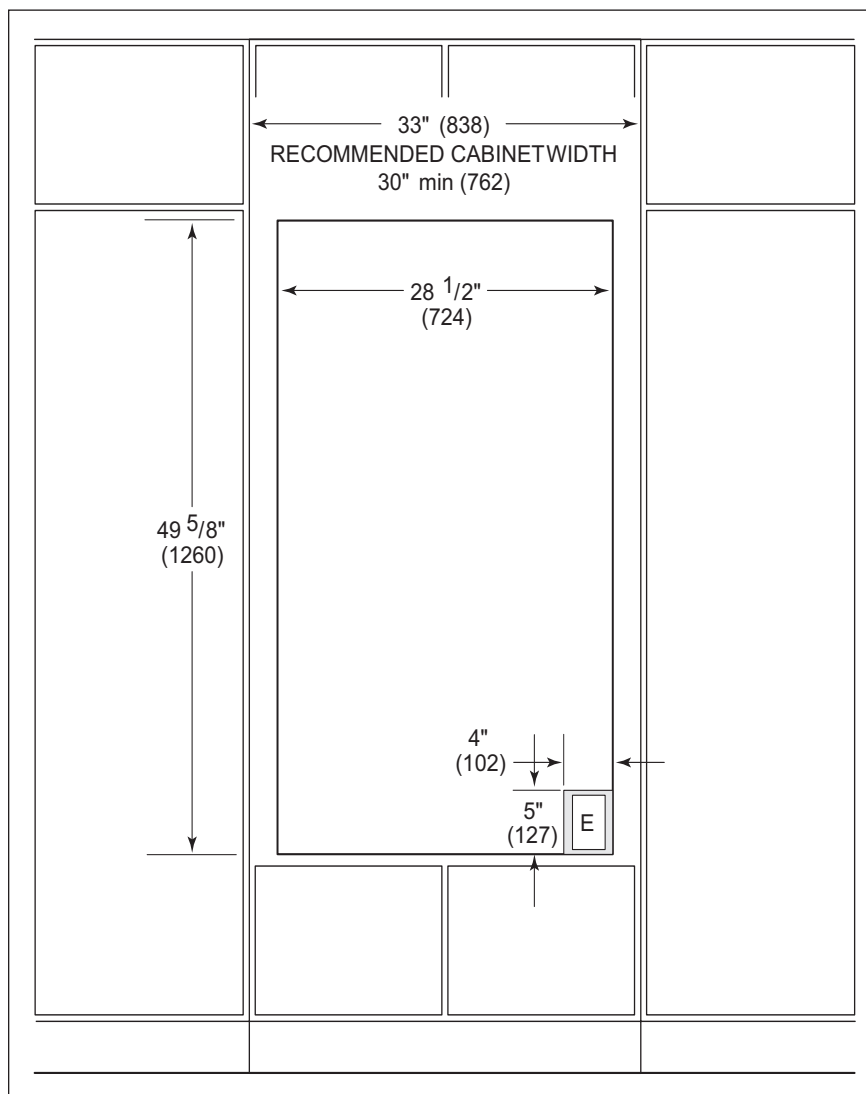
Front Cutout Dimensions and Electrical Placement
